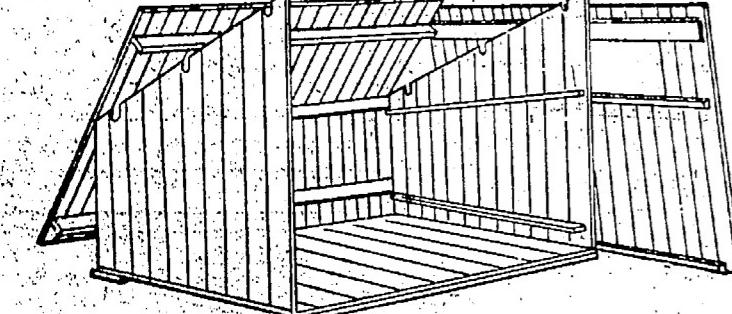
Hog cot with upright walls and shed roof, taken down.
